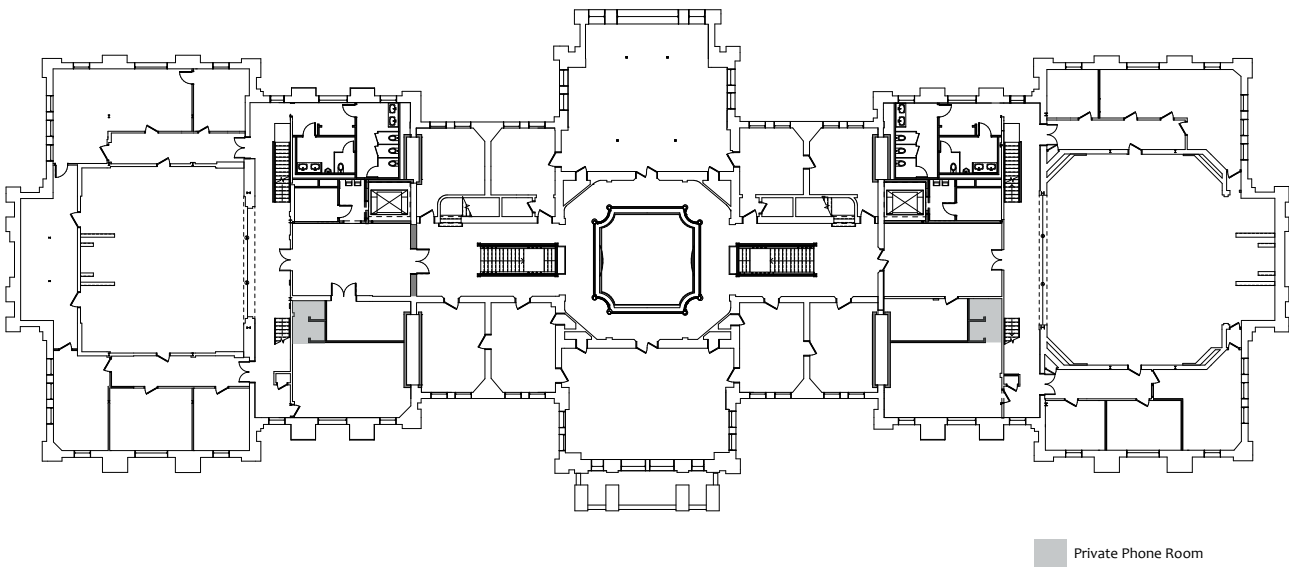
Support - A/V and Phone Rooms - Second Floor [Capitol]
